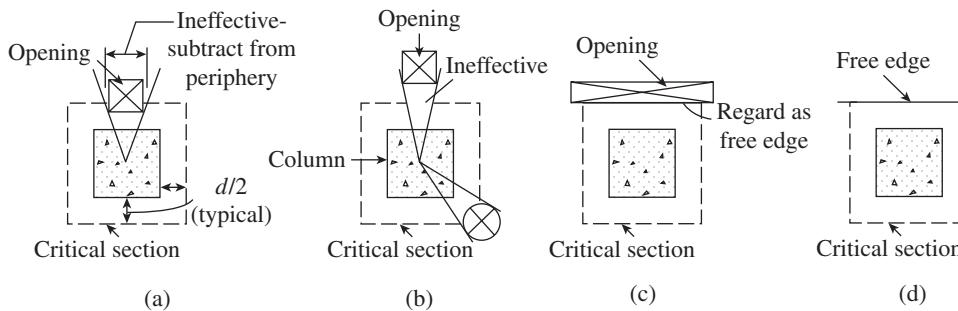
Effect of opening on shear strength of slabs (a) Opening on the critical perimeter (b) Opening away from the critical perimeter (c) Large opening near critical perimeter (d) Column near the edge of building
